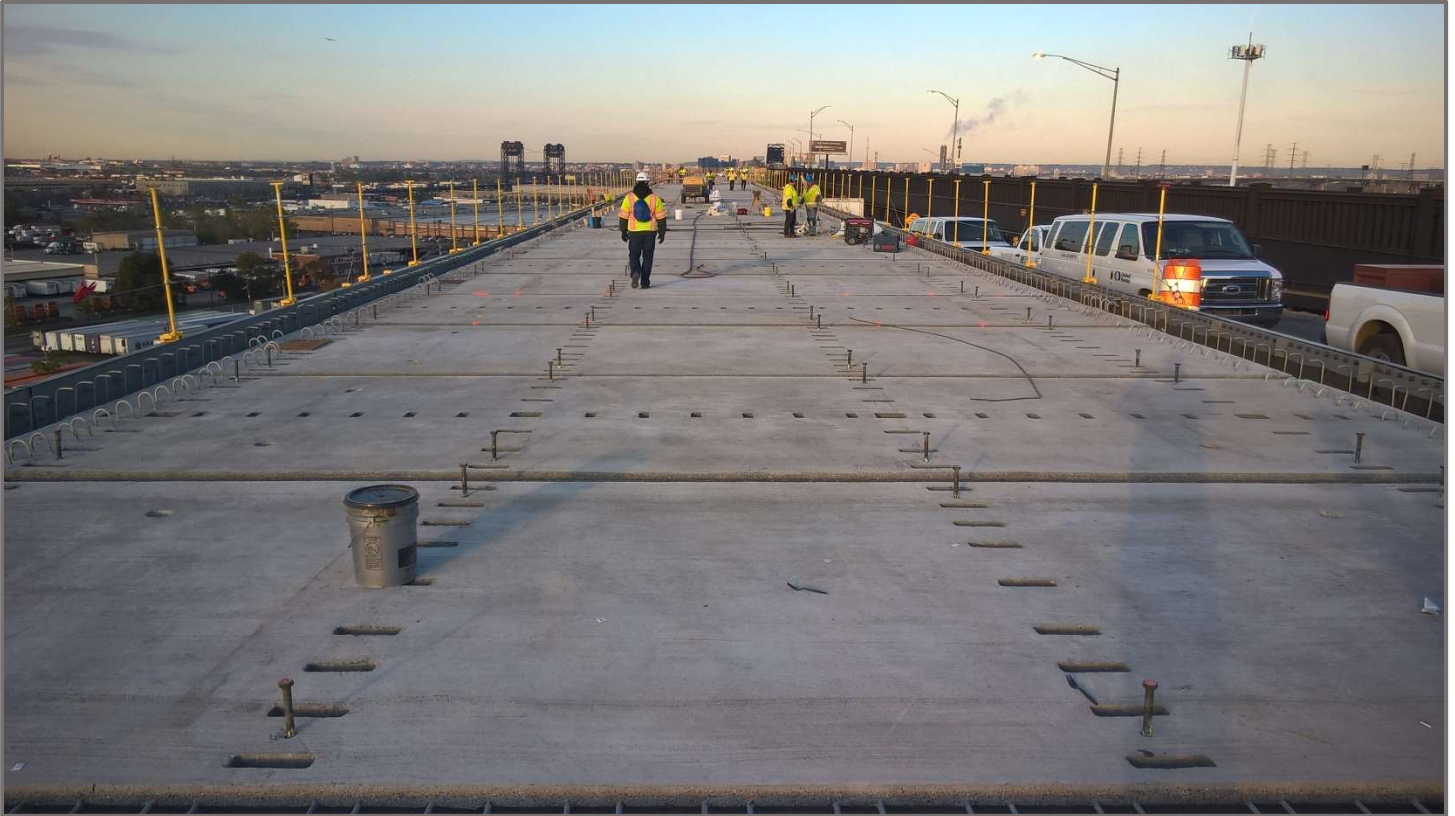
Precast full-depth concrete deck panels in place prior to UHPC placement © 2018 WSP USA
